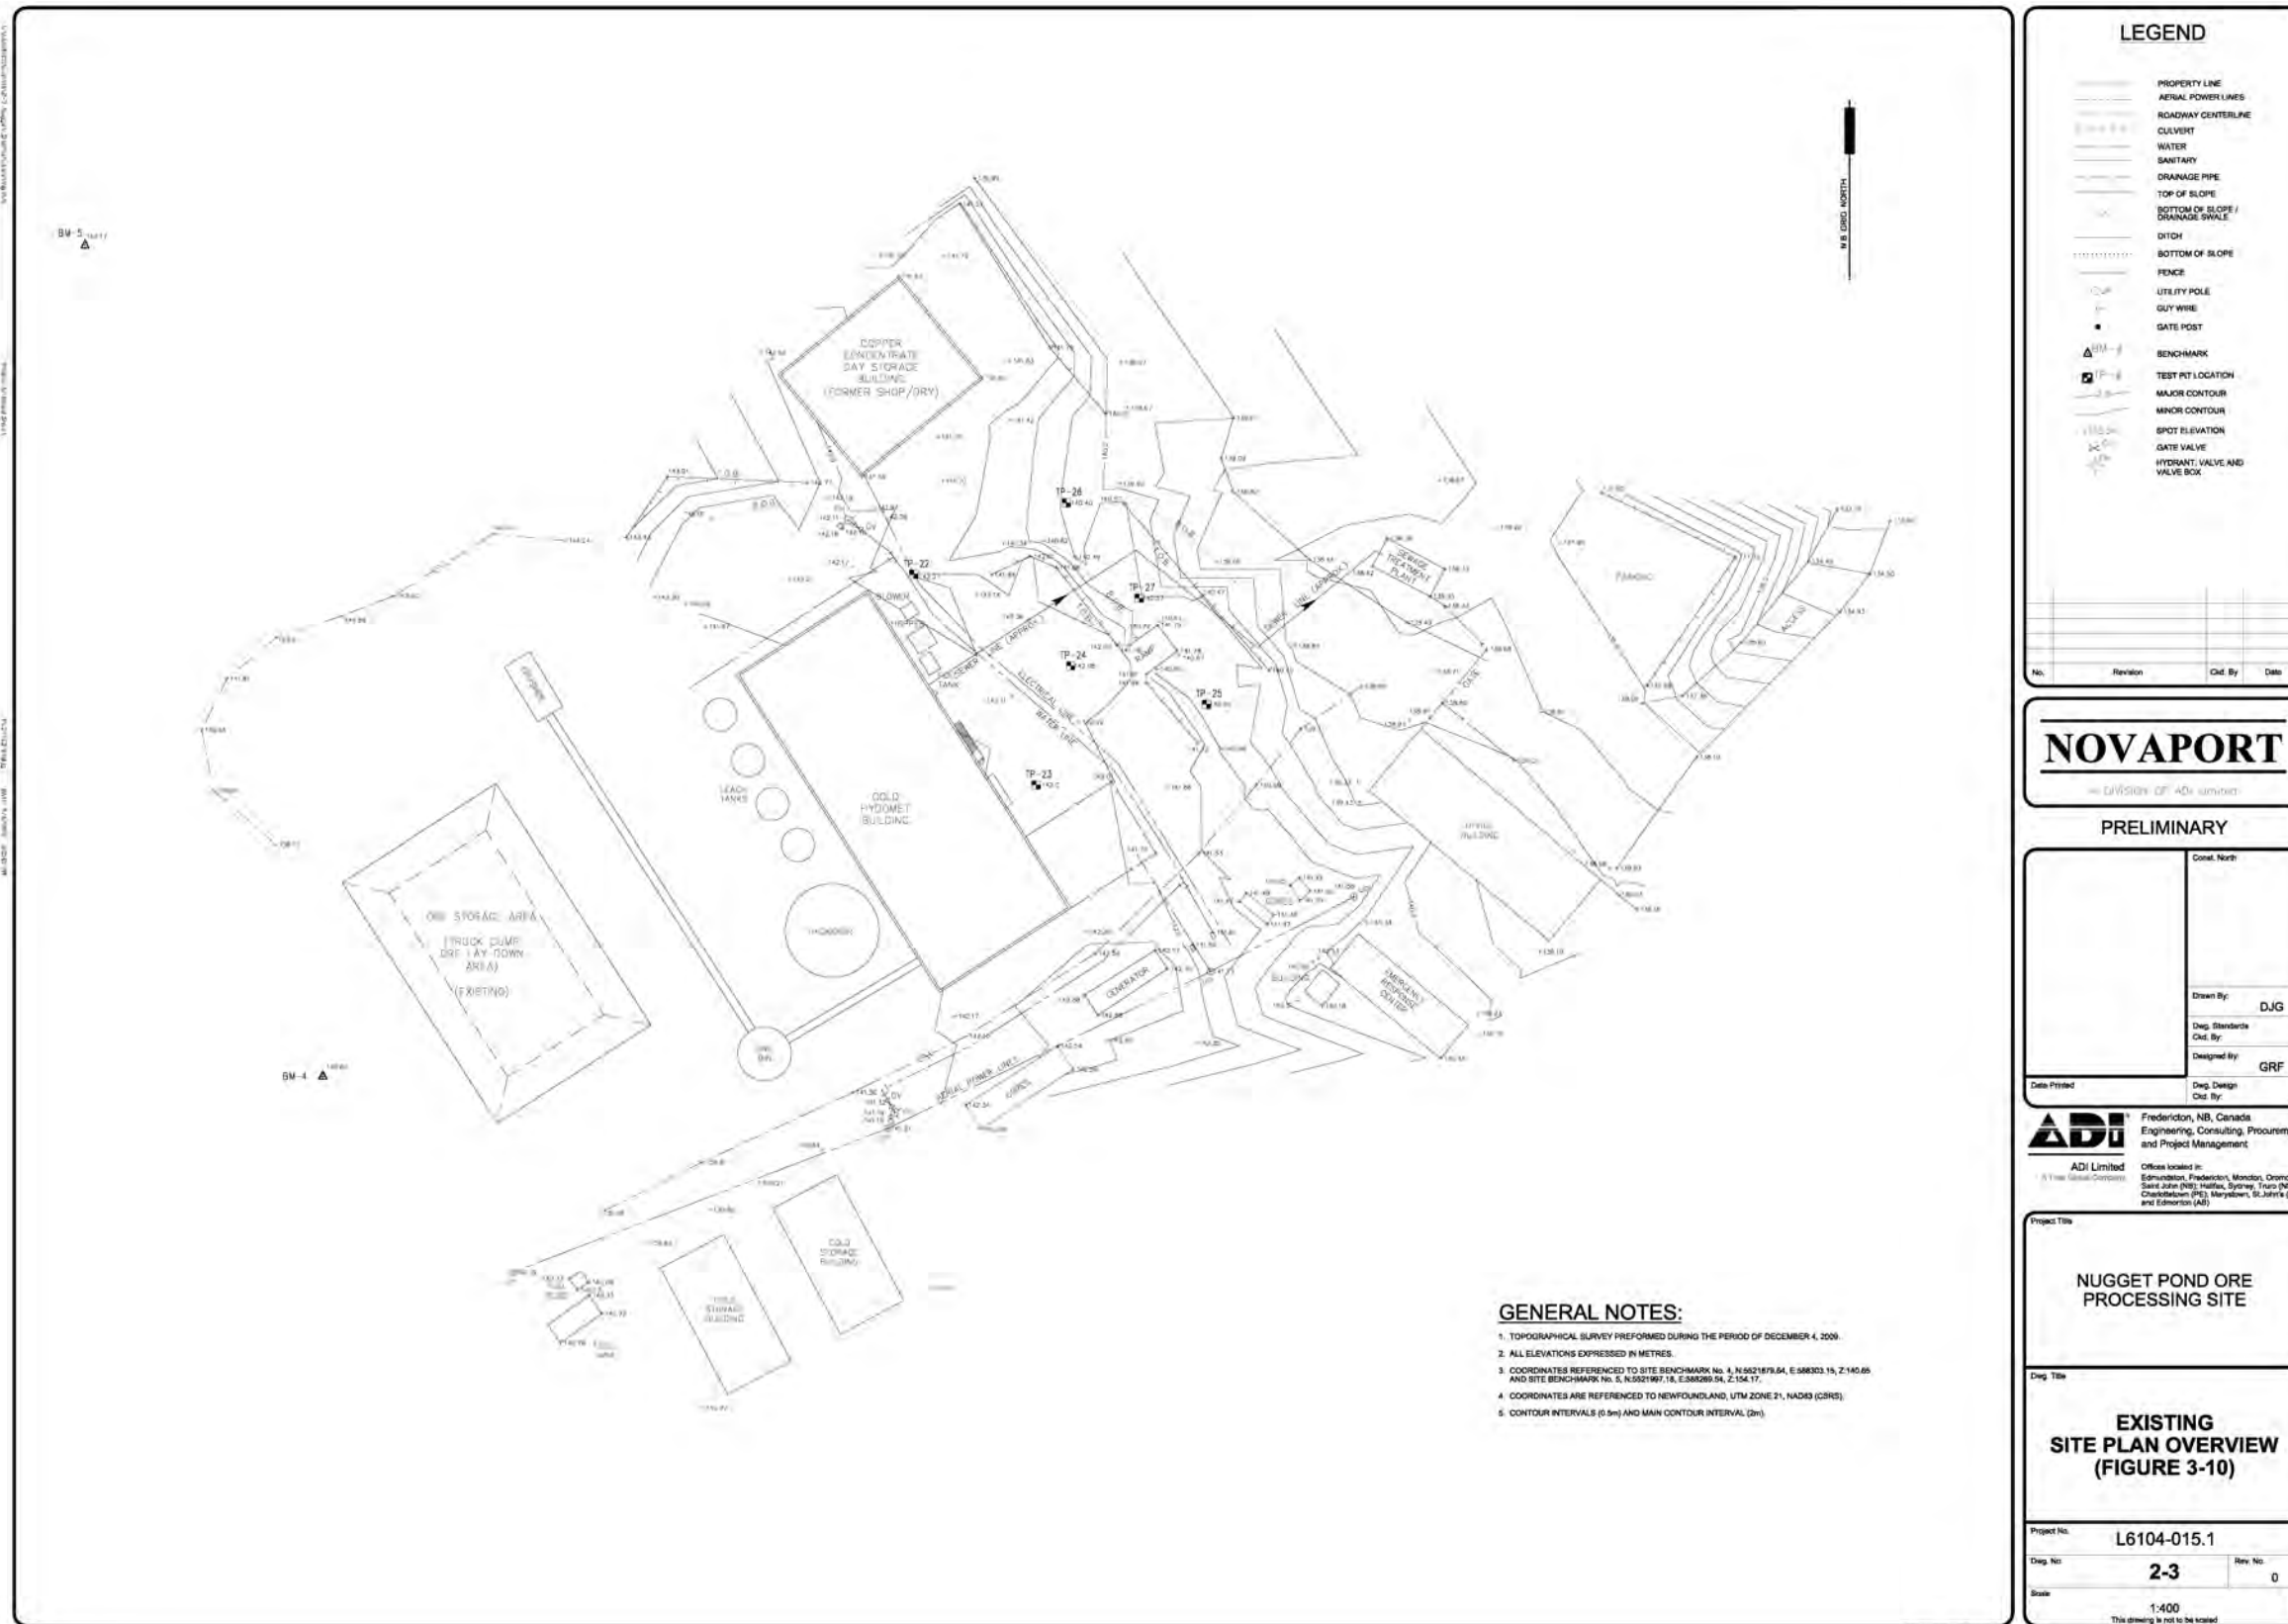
Existing Infrastructure at the Nugget Pond Site
